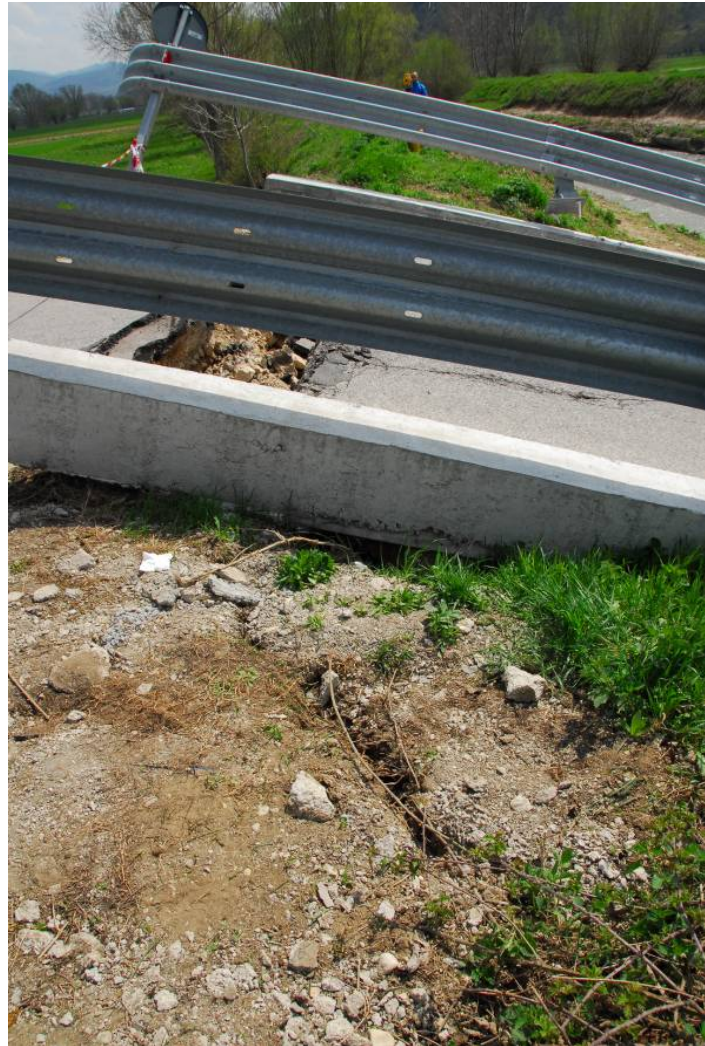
Ground cracking in levee directly beneath western abutment along northern side of Aterno River (42.325N, 13.463E).
